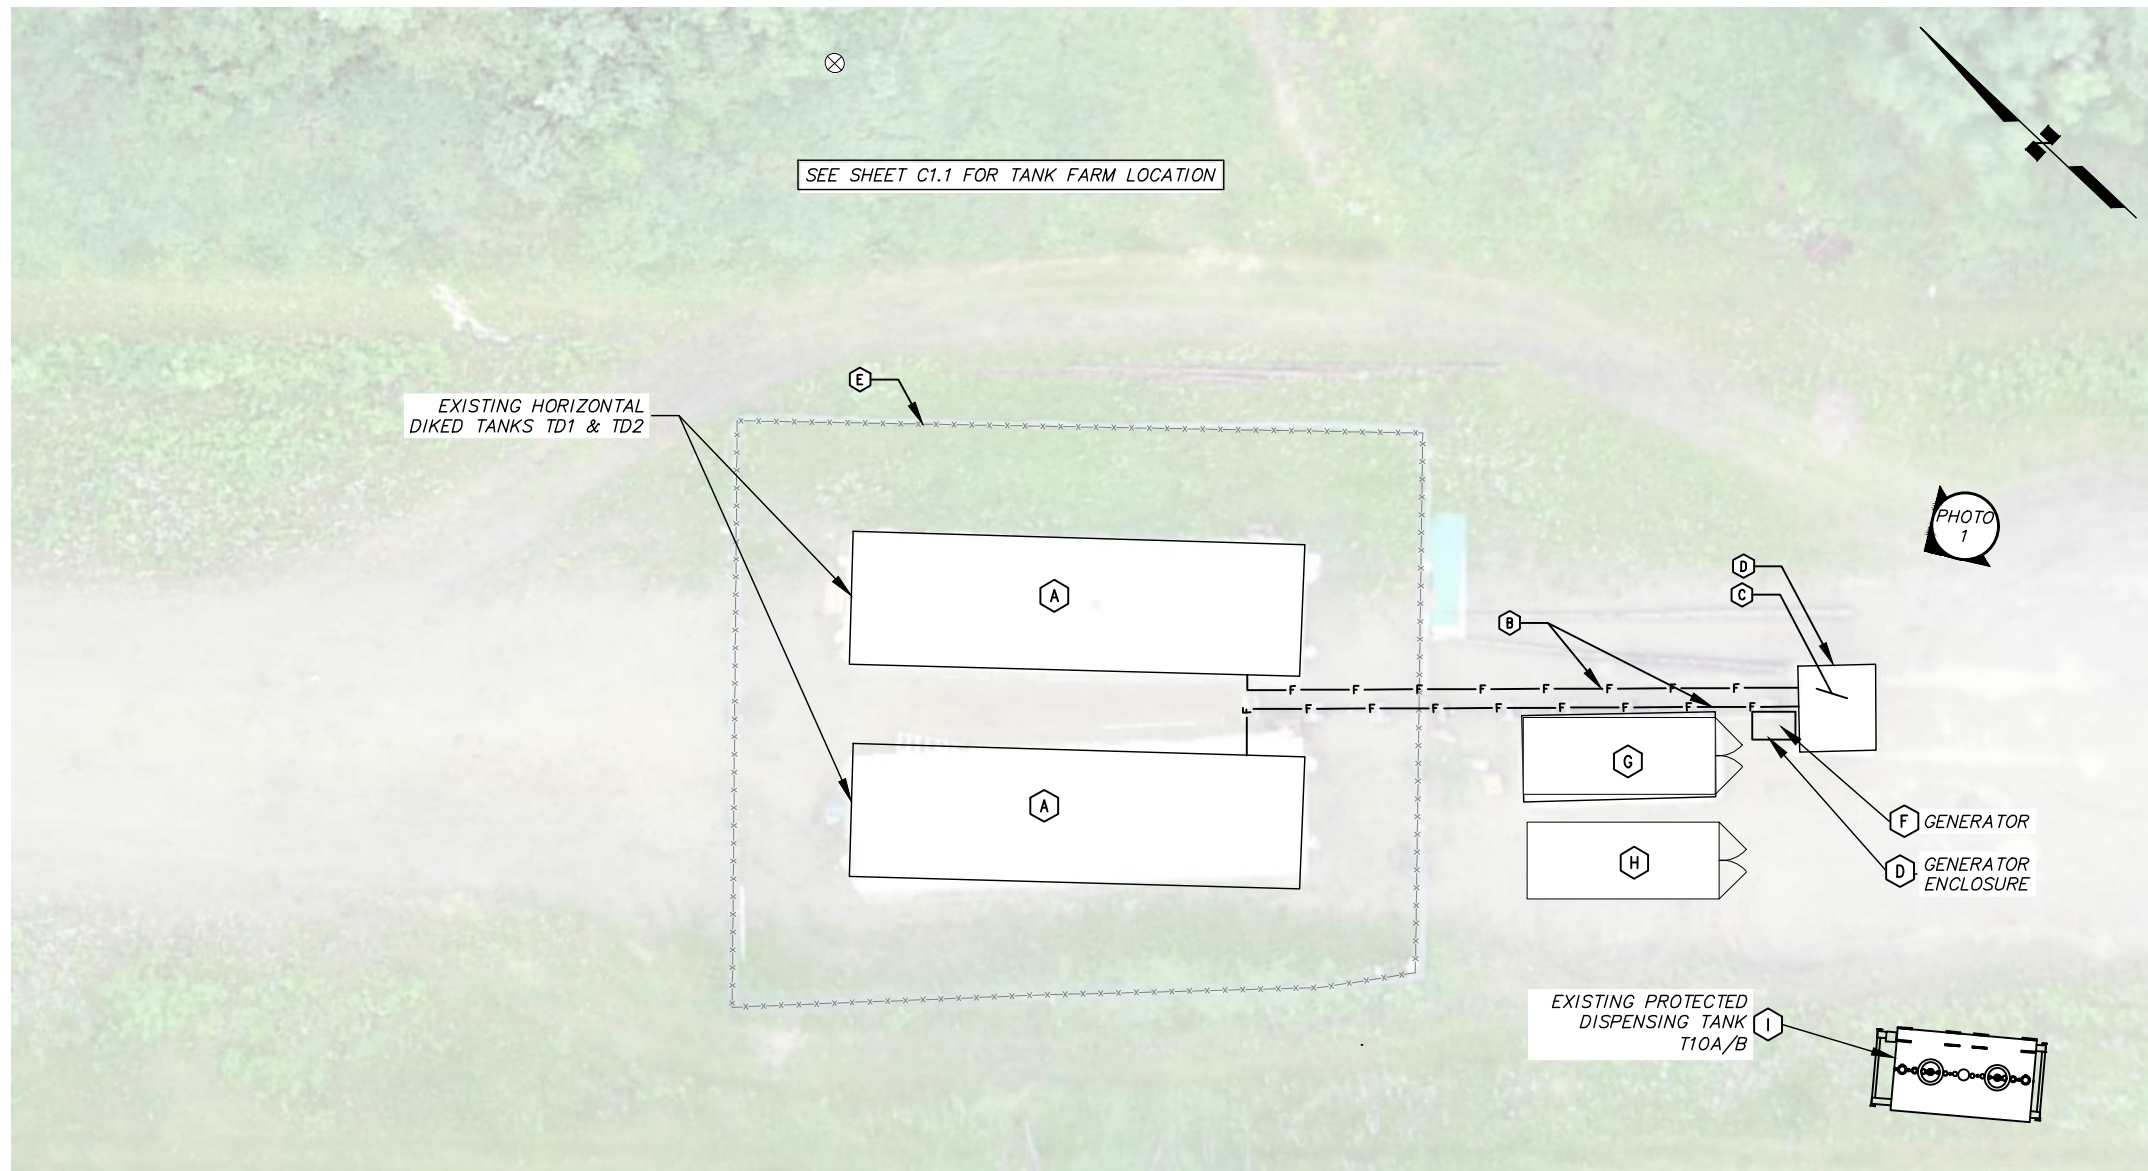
CORPORATION TANK FARM AND RETAIL DISPENSING FACILITY, SUMMER 2025
